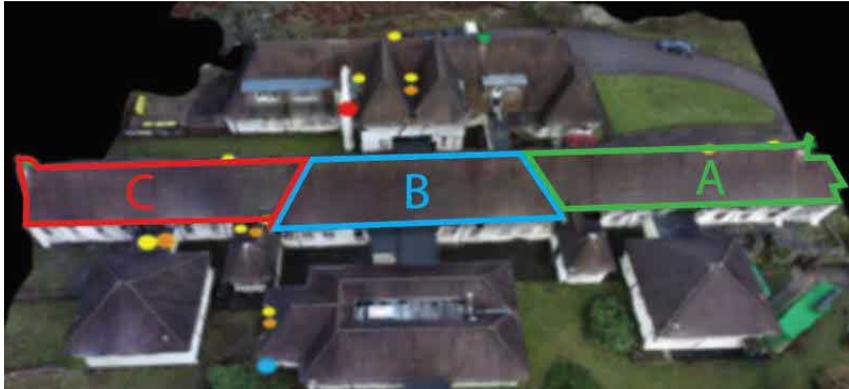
Proposed works to be undertaken on Area B1 and B2 of the Listed Building
